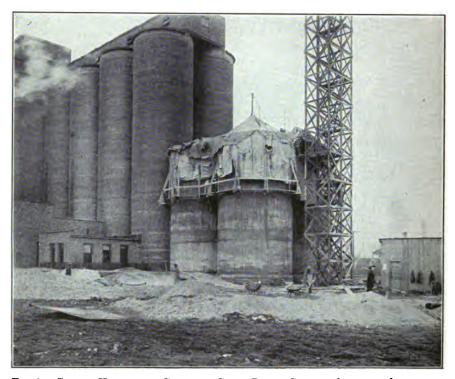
Canvas Housing on Concrete Grain Bins. Space under canvas kept warm with salamanders. Concrete mixed by hand beneath this protection.
